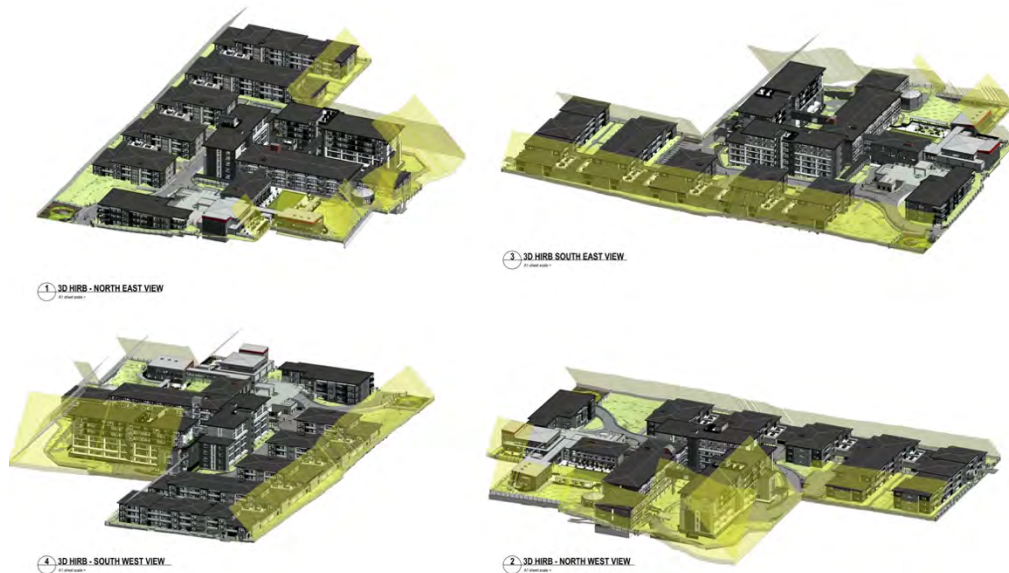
Proposed Building Heights 3D (Ryman Drawing RCA10 ..A0-41).
